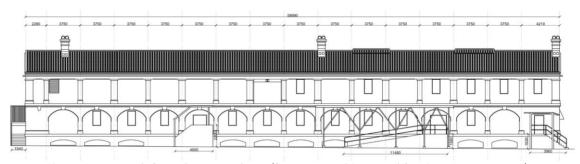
North façade, nowadays. (Source: Architectural Services Department)
